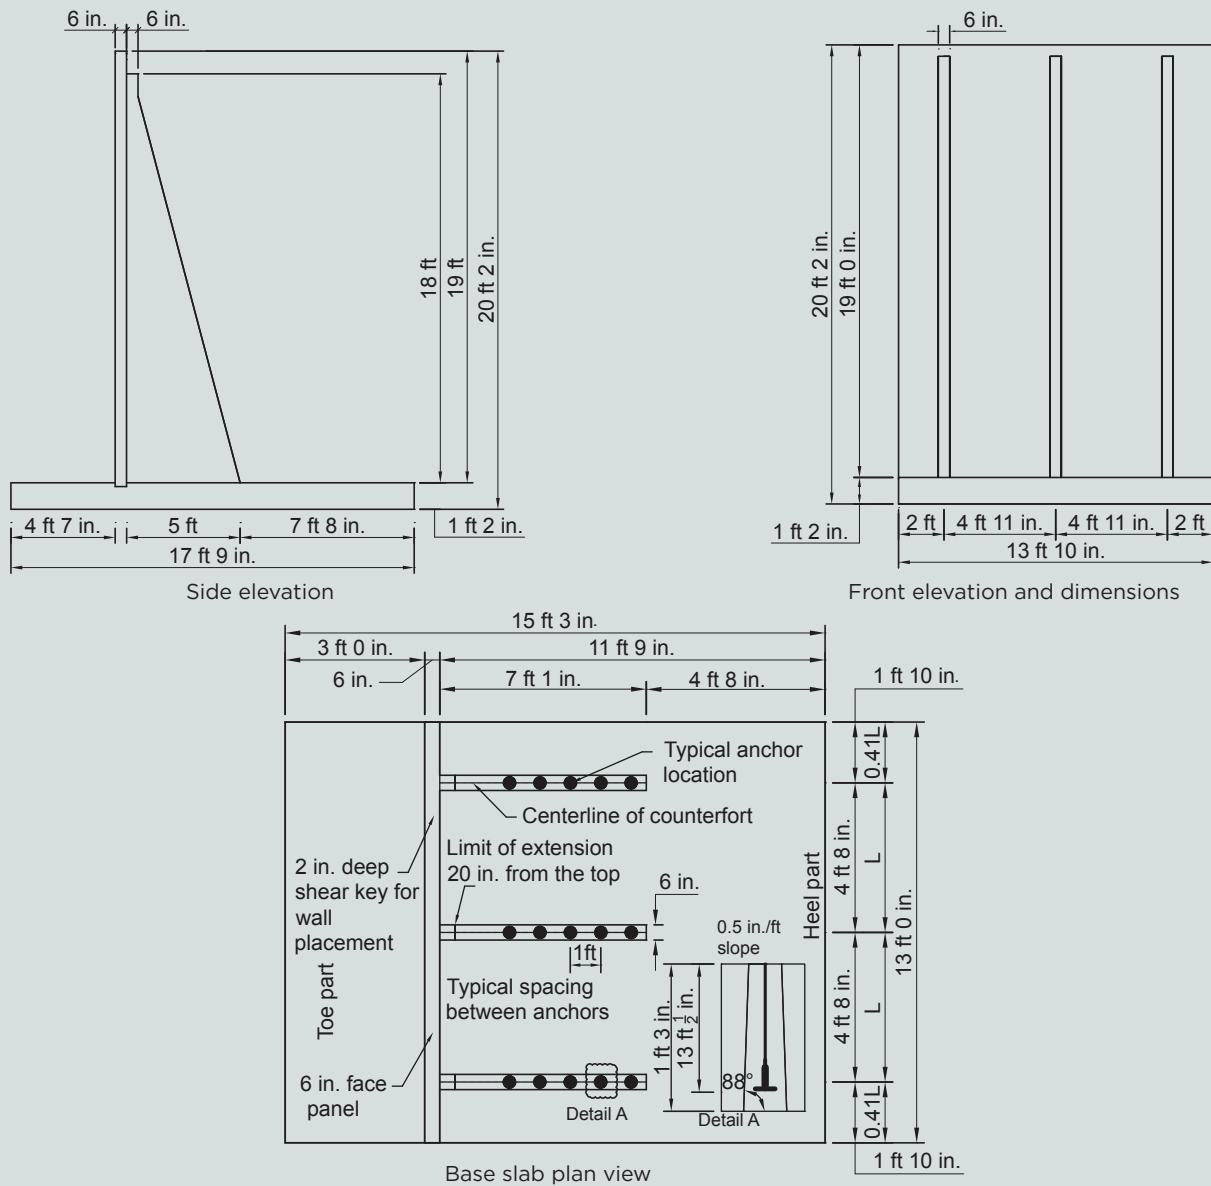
Geometric layouts of the totally prefabricated counterfort retaining wall system. Note: L = center-to-center spacing between two adjacent counterforts. 1 in. = 25.4 mm; 1 ft = 0.305 m.
